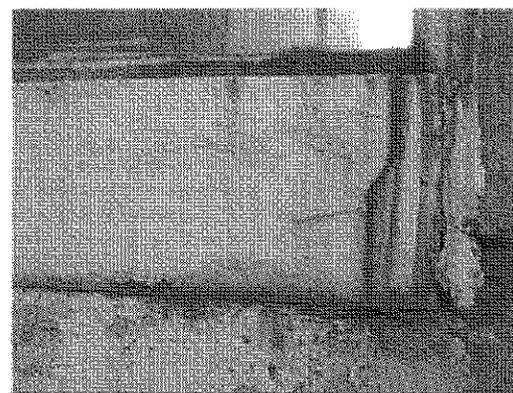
Example of rust damage to window frames in common area stairways
